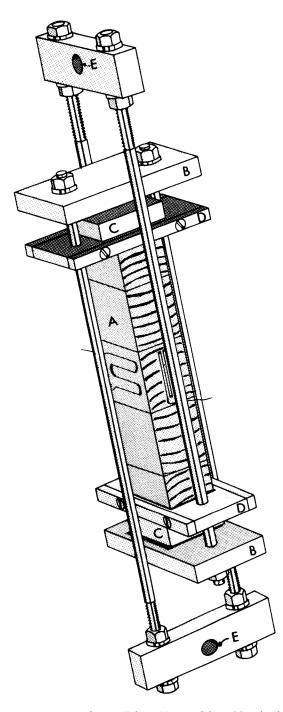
Test specimen, A, in loading fixture. B is end block. C is end bearing block. D is centering guide. E is hole for metal dowel connection to universal joint. Ball bearing is centered between B and C at each end.
